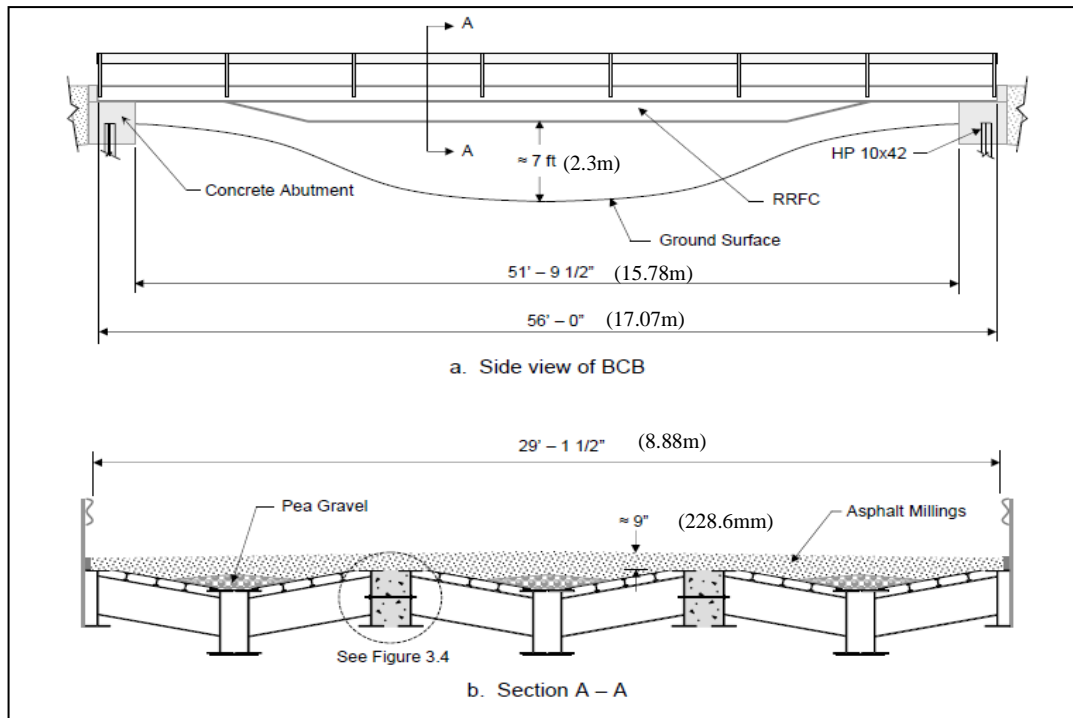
Single Span Bridge layouts (Taken from Doornink et al. 2003)
